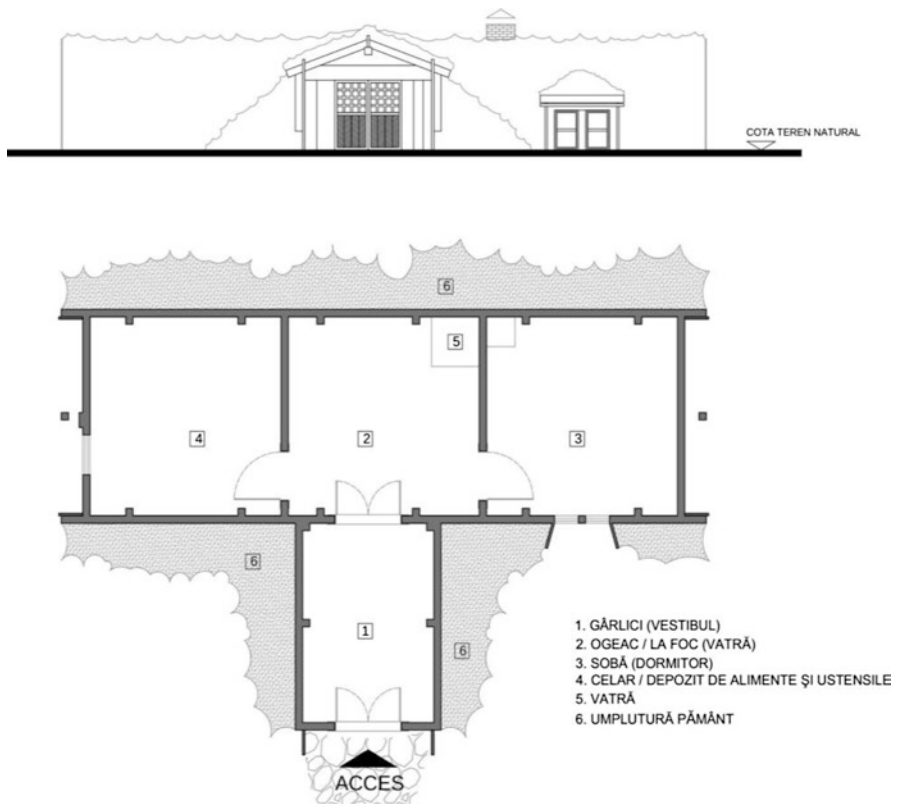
“Bordei” with four rooms in the Castranova village, Dolj County. Plan and the main facade [11]
